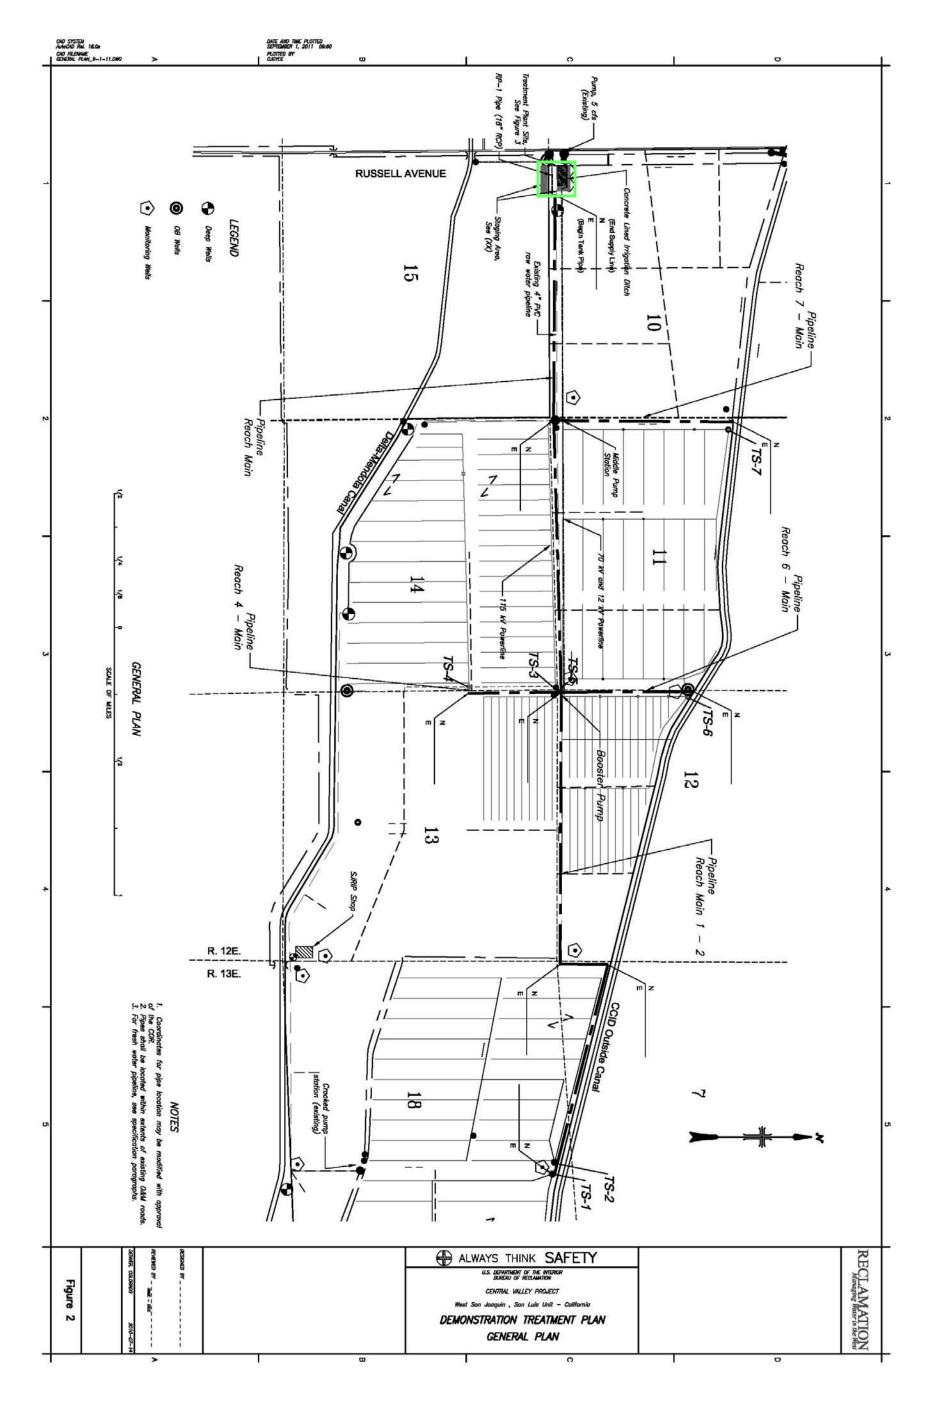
Proposed Action area (approximate 4-acre Facility footprint and 8-acre temporary staging area outlined in green)
